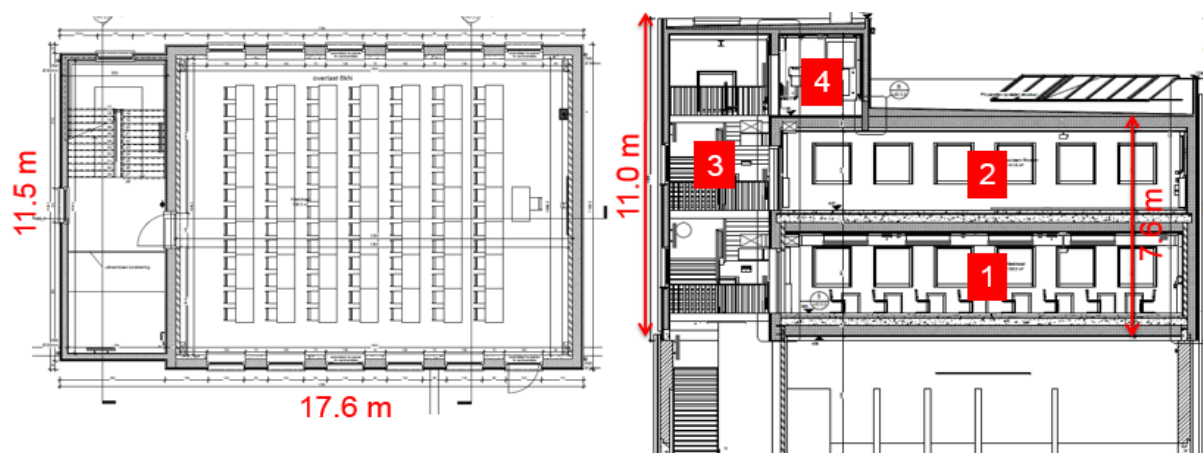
Plan and cross-section of the test classrooms: (1) classroom 1<sup>st</sup> floor (2) classroom 2<sup>nd</sup> floor (3) staircase (4) Technical room with AHU
